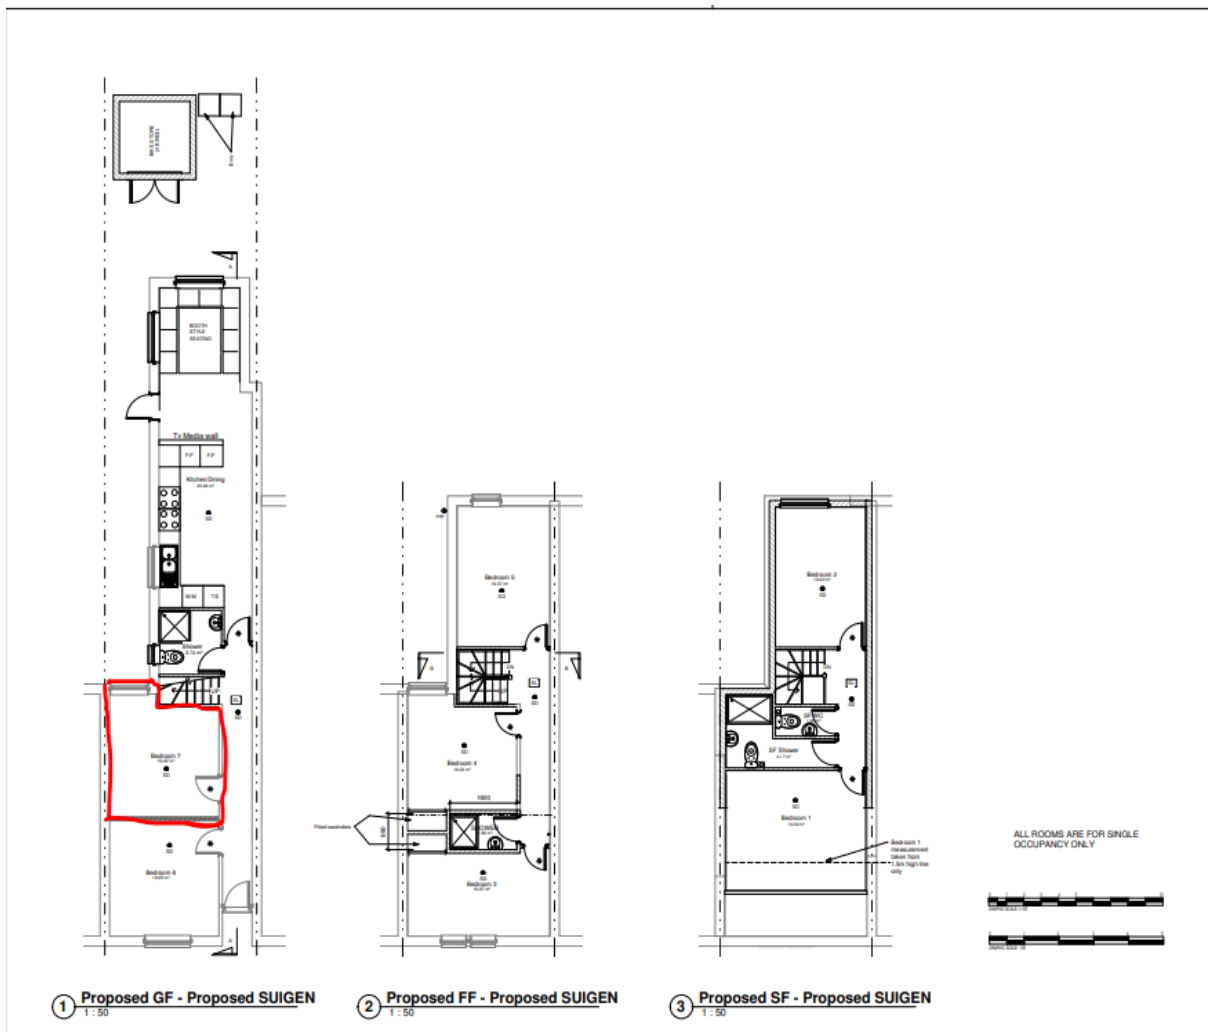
The only change proposed within the property is the use of the room outlined in red above, from a living room, to the proposed seventh bedroom.
